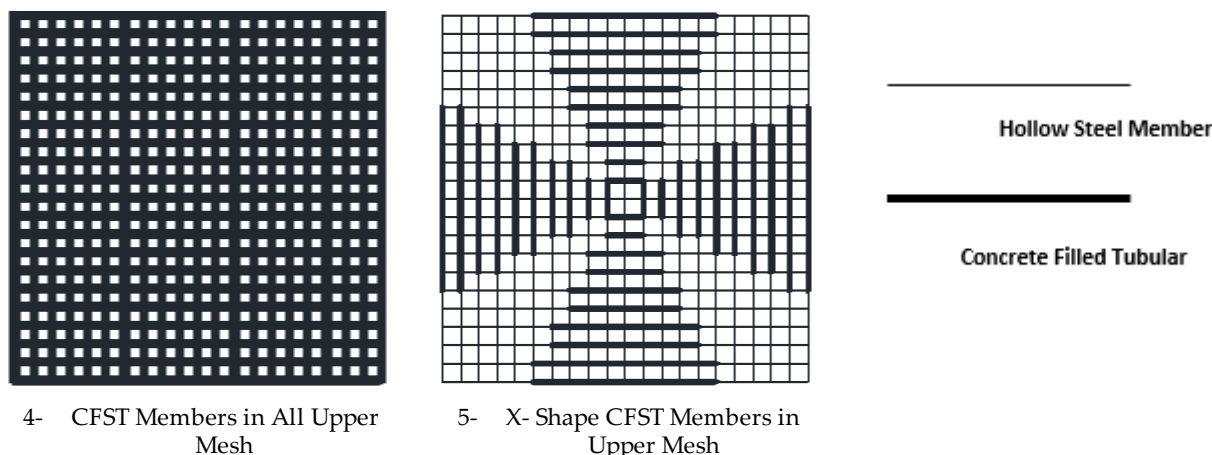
Arrangement of Upper Mesh Members for Space Truss.
